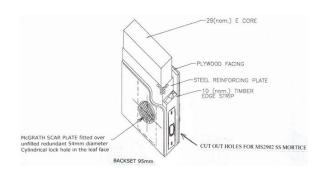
Latch edge side view of the tested hardware Figure 4 Planned Hole Cutout
